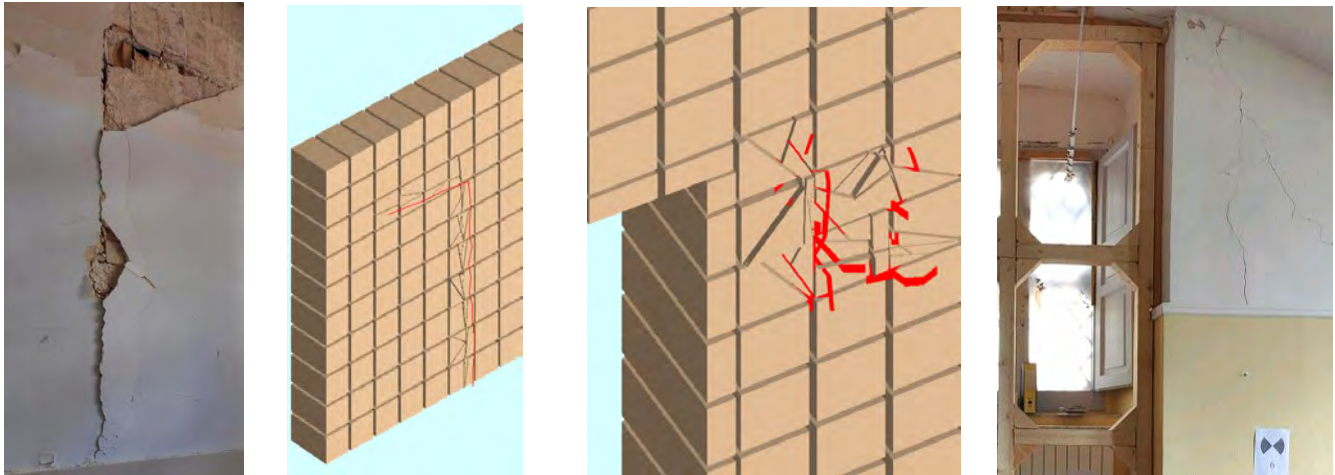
Sample for cracks and damage modeling in ground floor walls.
